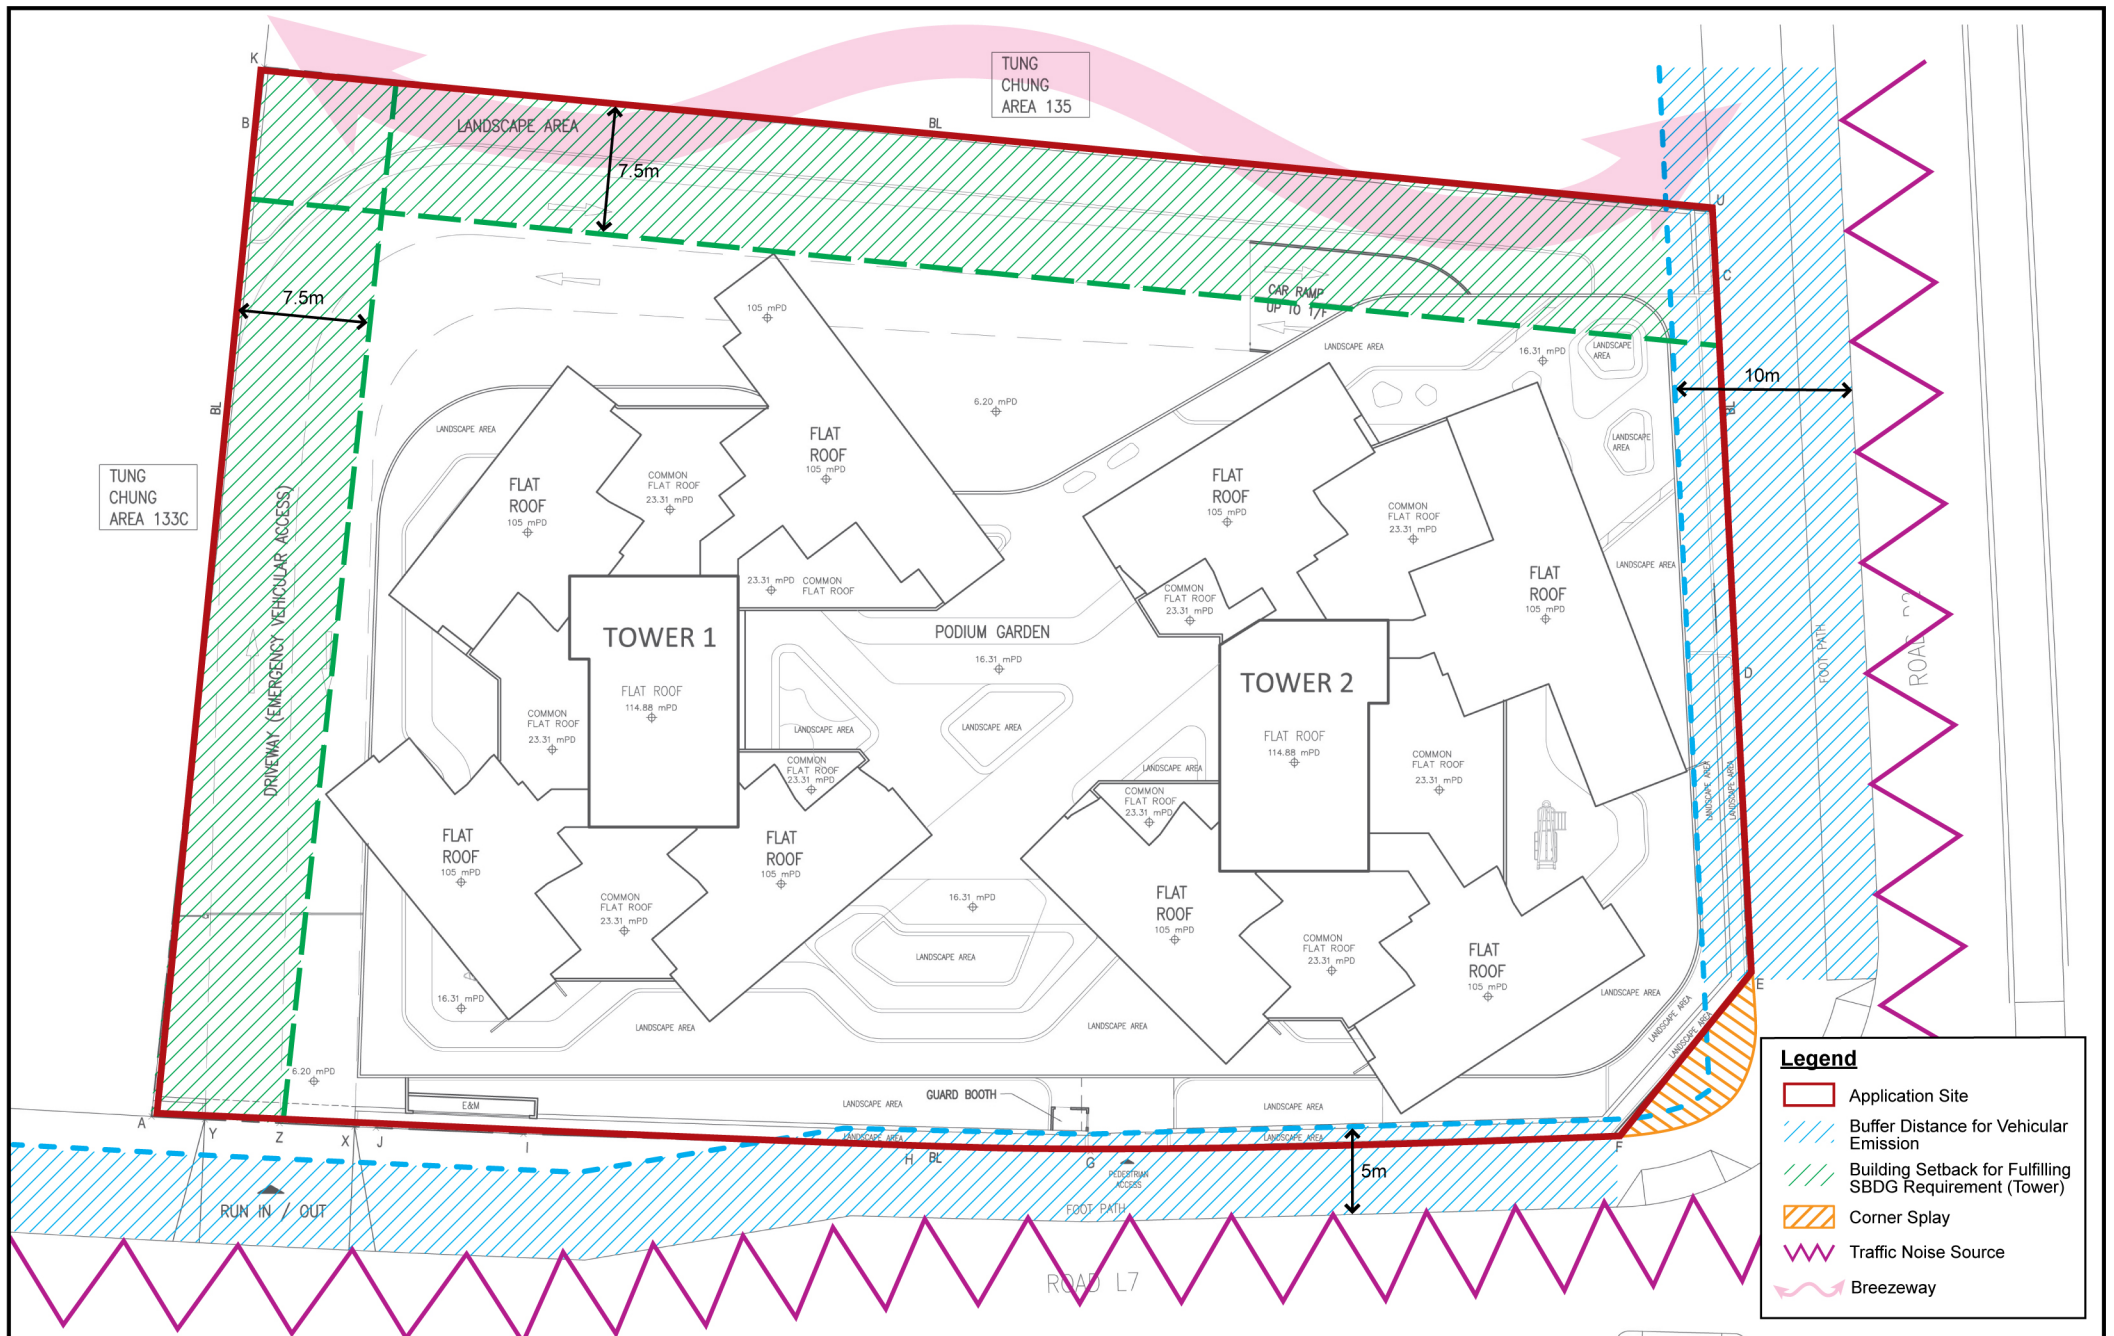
SITE AND DESIGN CONSTRAINTS PLAN
